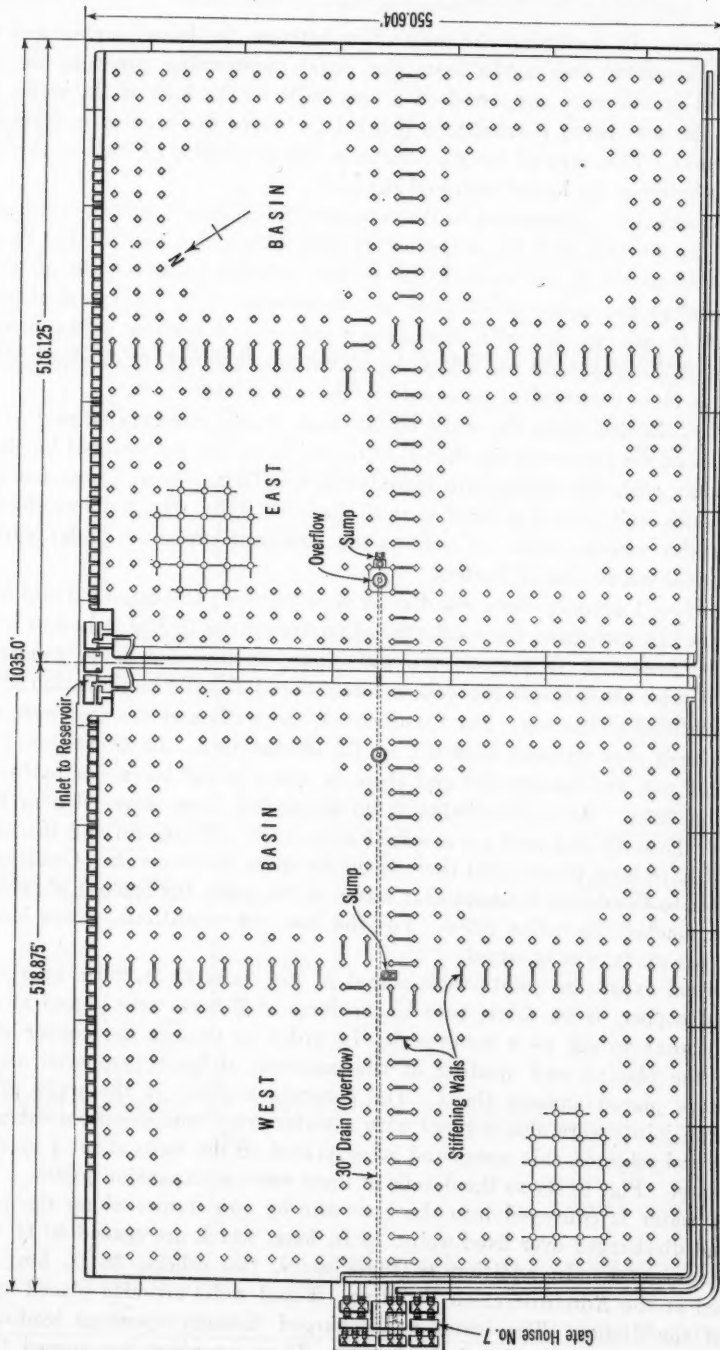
PLAN OF FLOOR, BALDWIN RESERVOIR.
